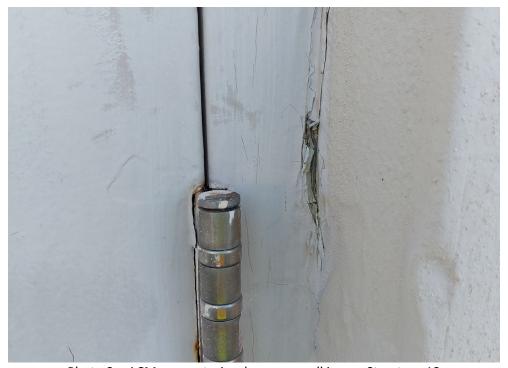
ACM grey exterior doorway caulking on Structure 12
